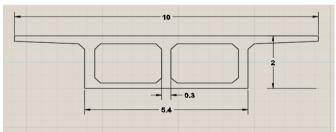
Cross-sectional details of rectangular box girder (all dimensions are in meter).
